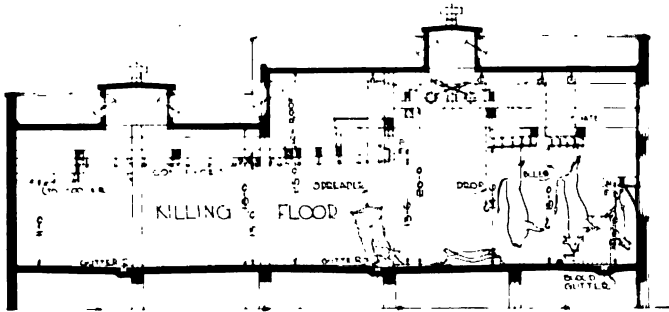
SECTION THROUGH KILLING FLOOR.
